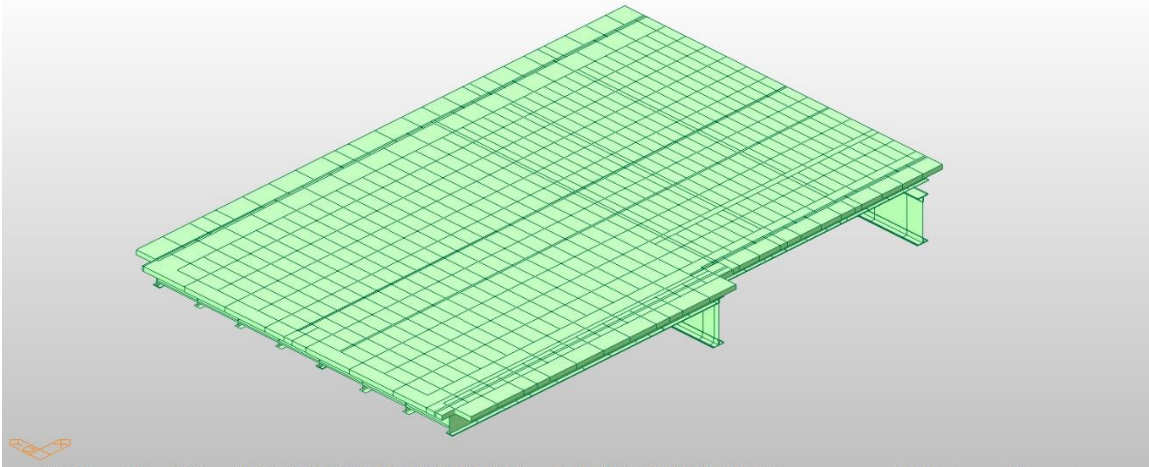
Approach and Tower spans at South Tower for 225mm Concrete and 90 mm Asphalt (Similar to North Tower)
